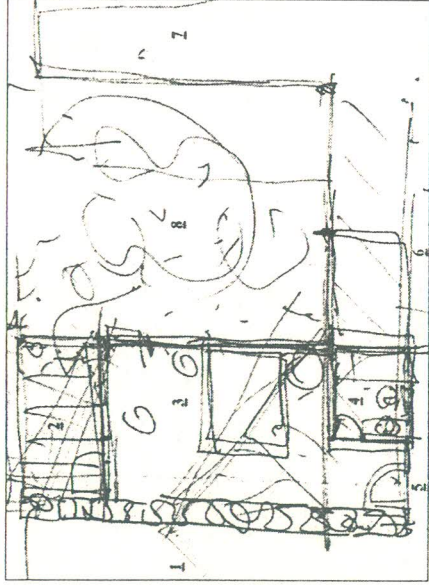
Depicting the site section (Actual size 15 X 6 cm)
